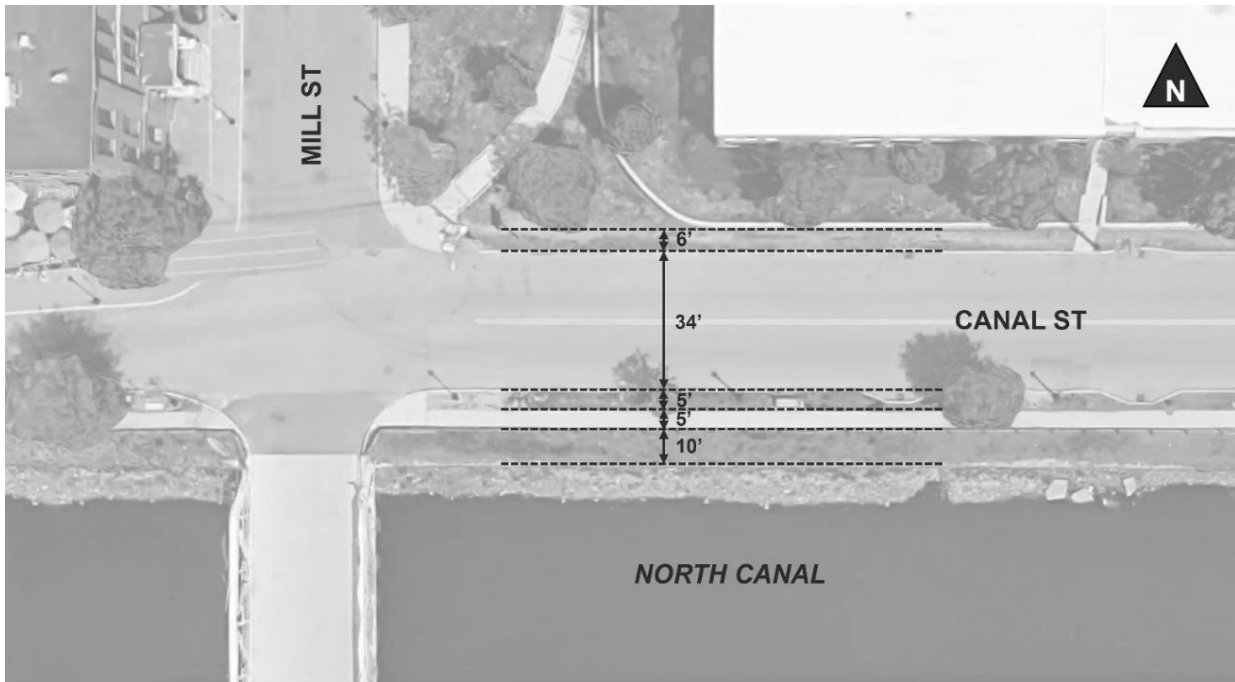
Approximate Segment 3 cross section of Canal Street near Mill Street
